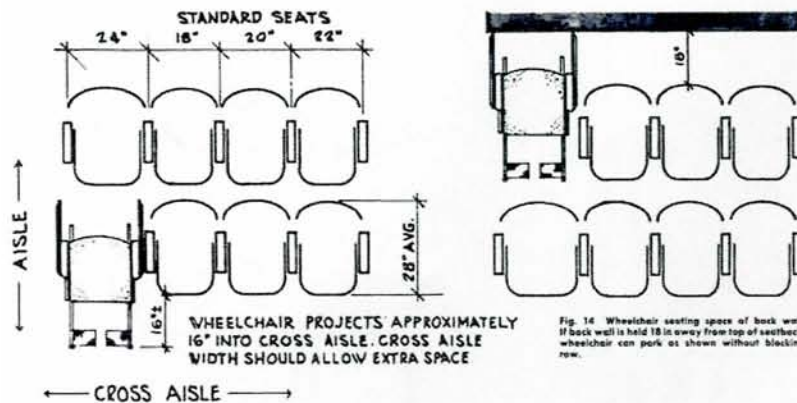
Wheelchair seating space of back wall. If back wall is held 18 in away from top of seatback, wheelchair can park as shown without blocking row.
